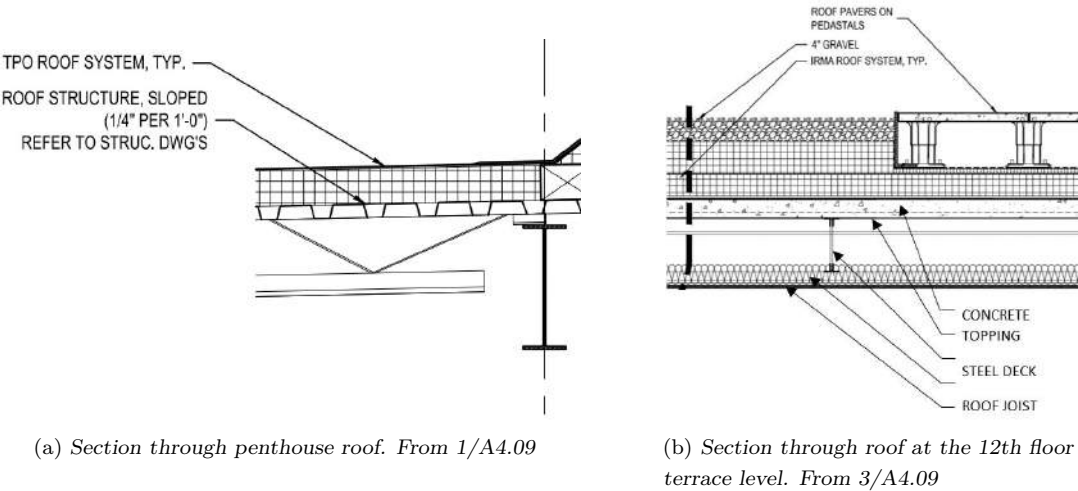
Sections through Penthouse Roof and Outdoor Terrace Roof
